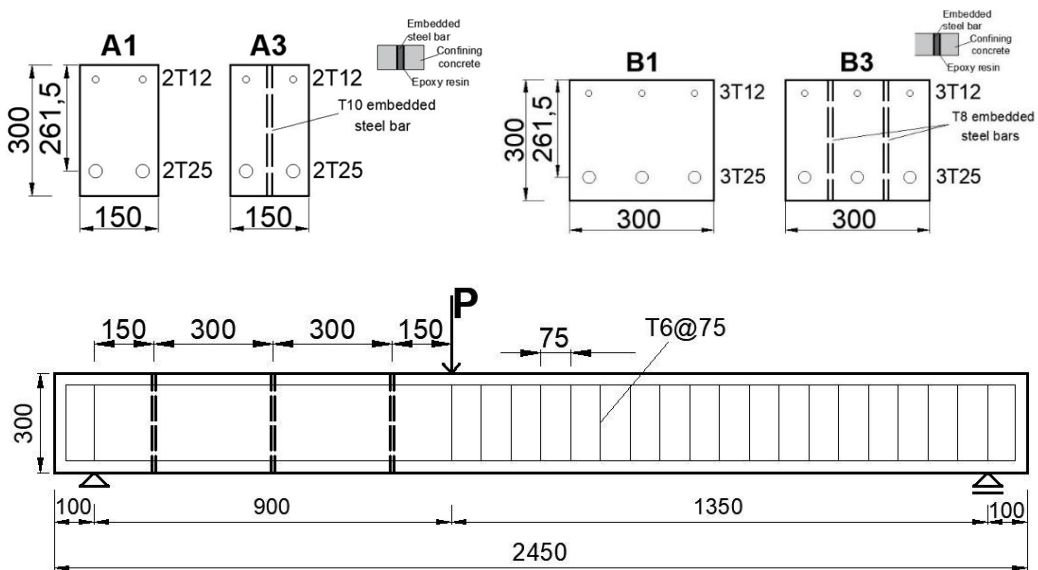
Cross-sections and elevation of RC beams tested by Barros and Dalfré [15] (dimensions in mm)
